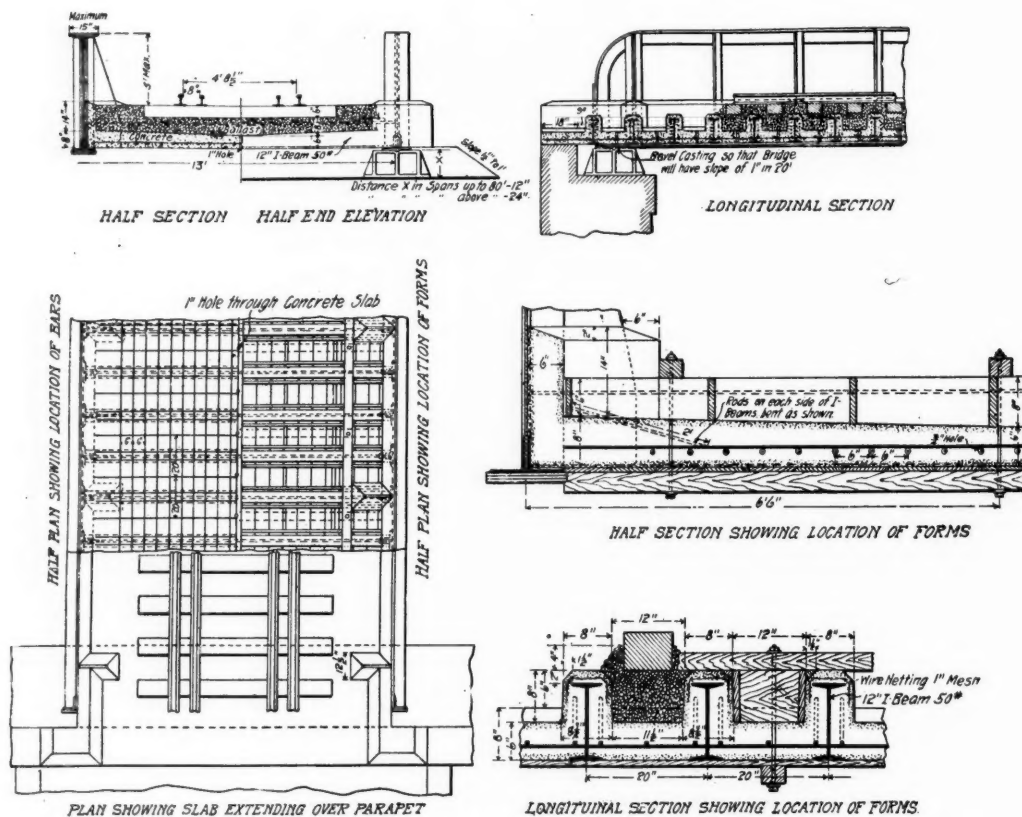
STANDARD REINFORCED CONCRETE FLOOR FOR THROUGH GIRDERS, "DESIGN C," WABASH R. R.
